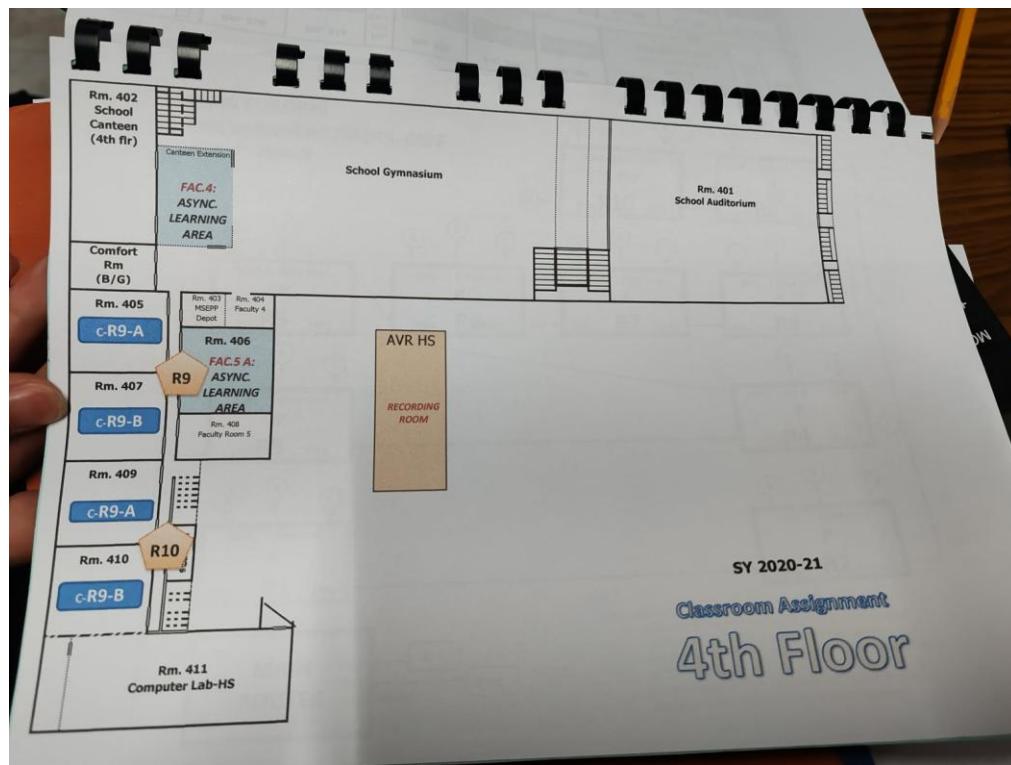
Floor plan of the fourth floor of NSDAPS' main campus
